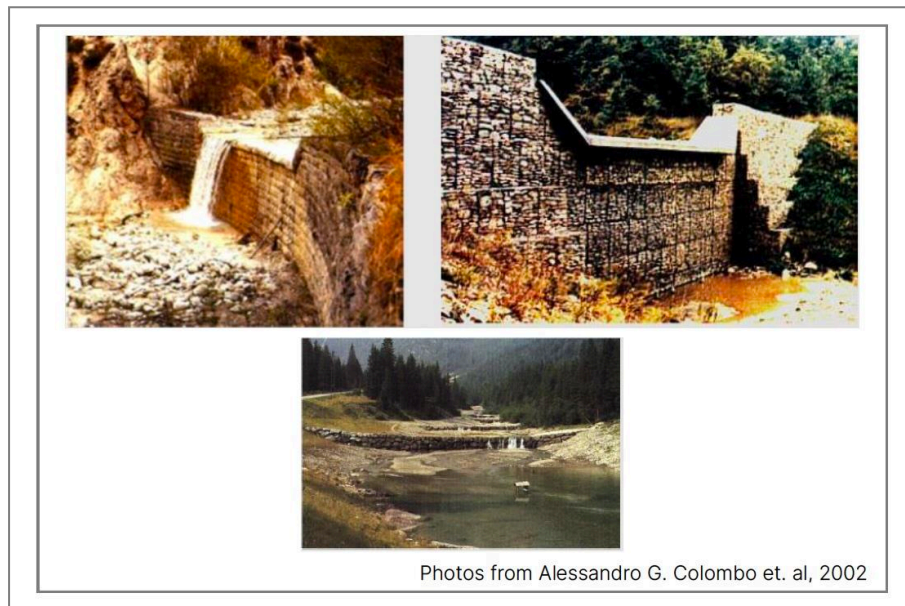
Water retention structures; concrete, gabion, and dry stone/wall dam
